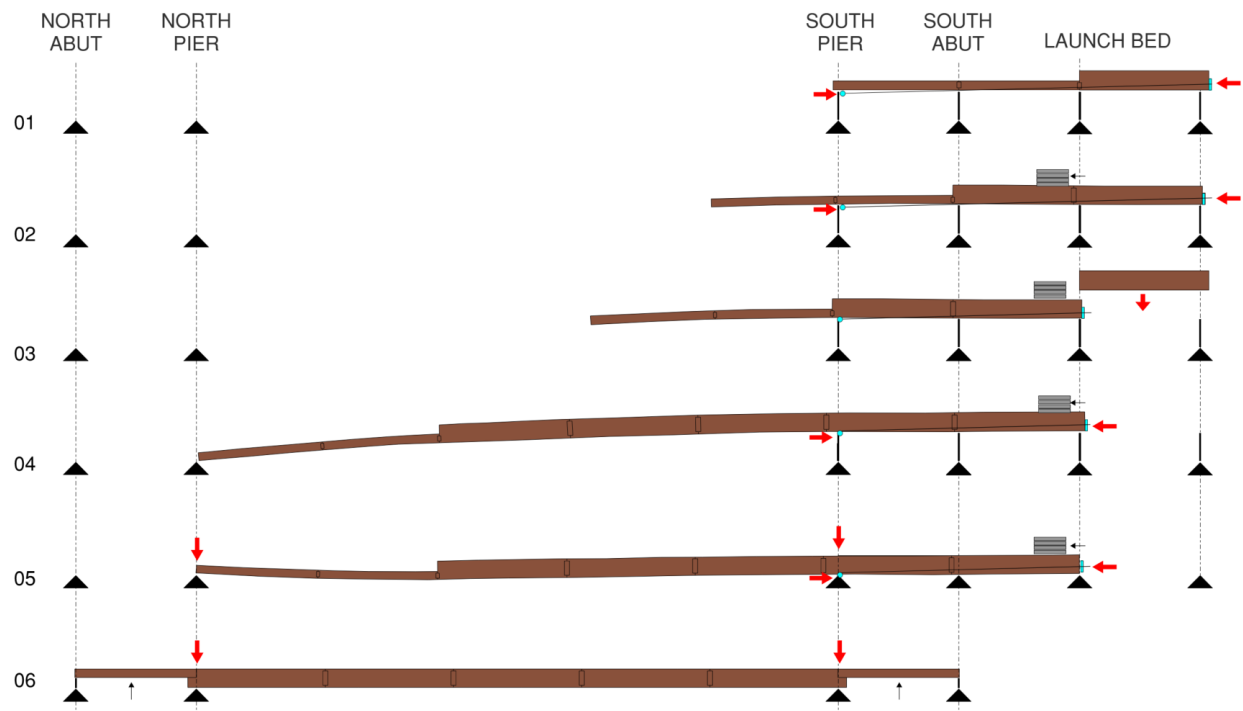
Girder launching sequence progressing from assembly on south bank launch bed (Step 01) to final girder position (Step 06).
